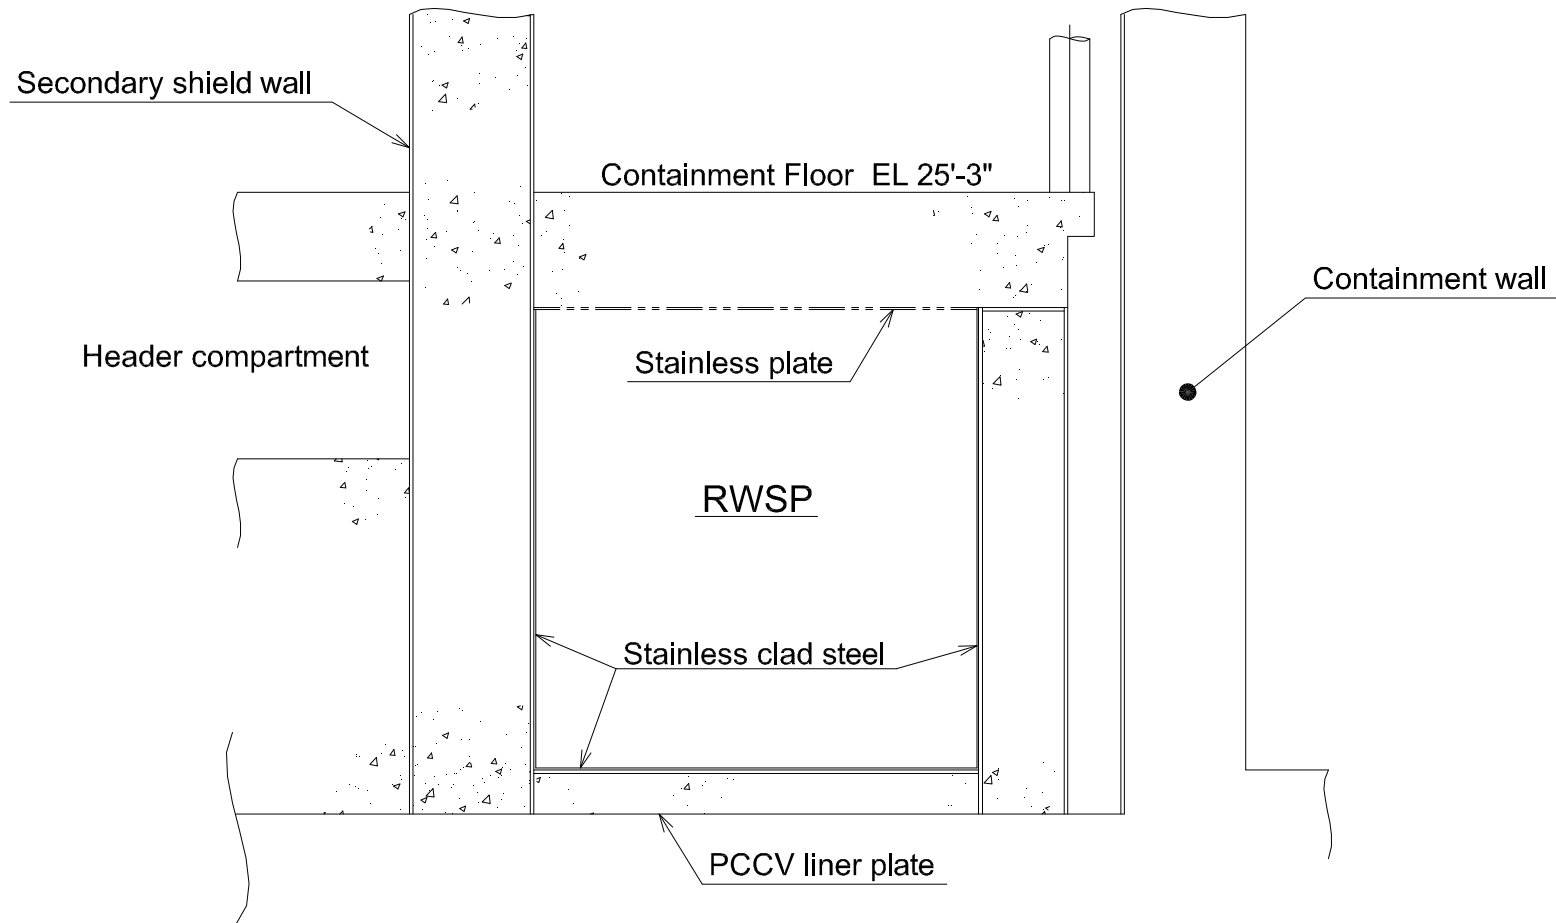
RWSP Concrete Structure Partial Sectional View
